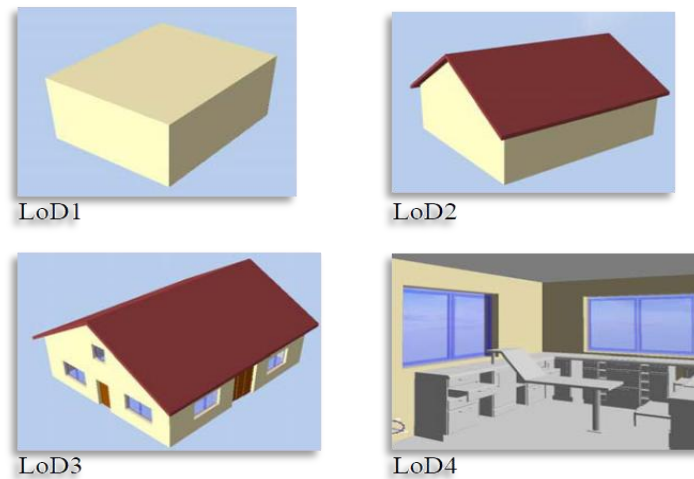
Level of Details for 3D Building Model (Fan & Meng, 2011)
